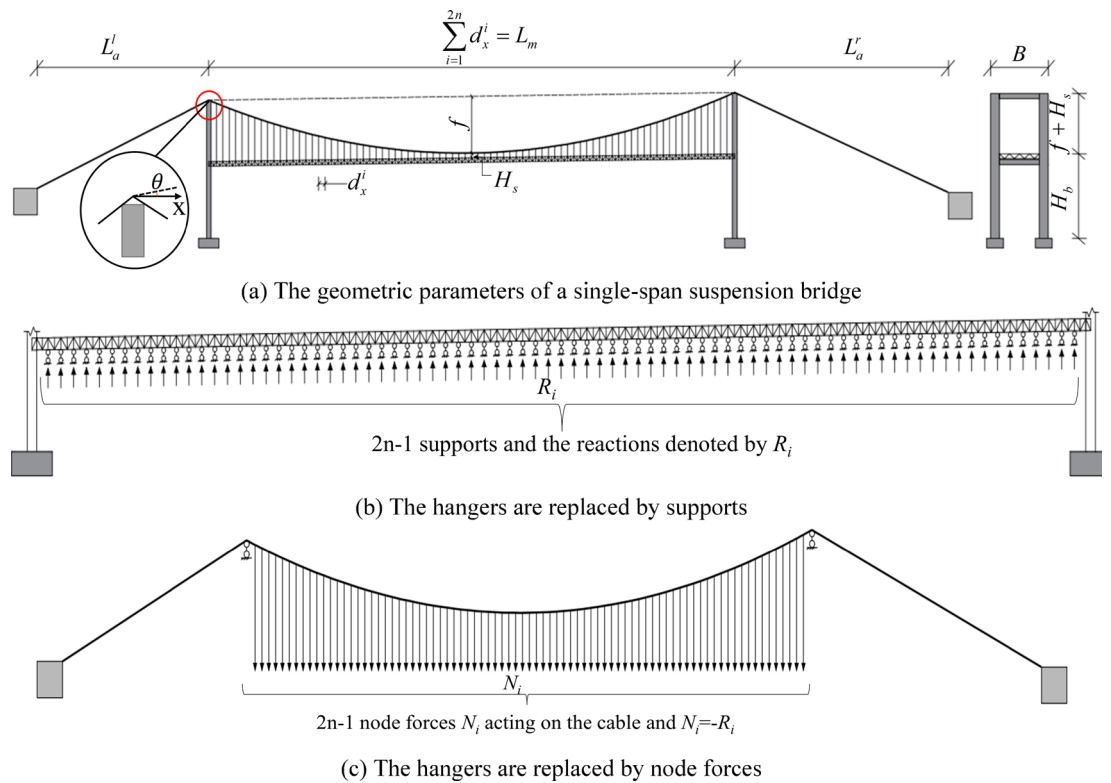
Pylon-girder system and cable system of suspension bridge.
